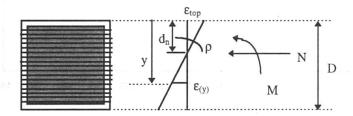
Concrete Filled Box Section Typical Strain Distribution
